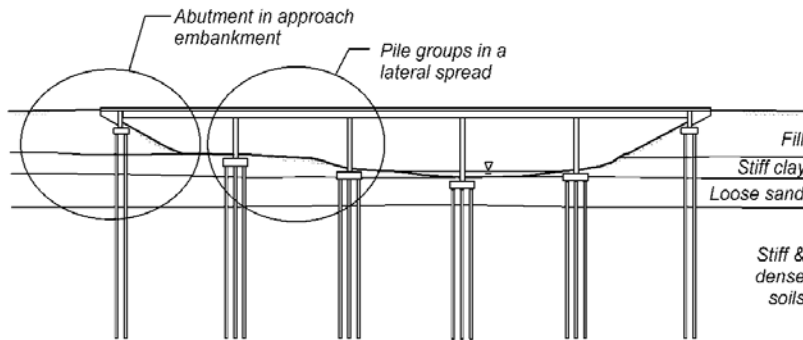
Typical cross section of bridge site showing two sub-systems requiring analyses of (1) pile groups in lateral spreading ground (developing due to soil liquefaction), and (2) pile-supported abutment in approach fill with potential global instabilities due to either construction or seismically induced (liquefaction) excess pore pressures (after Ashford et al. 2011).
